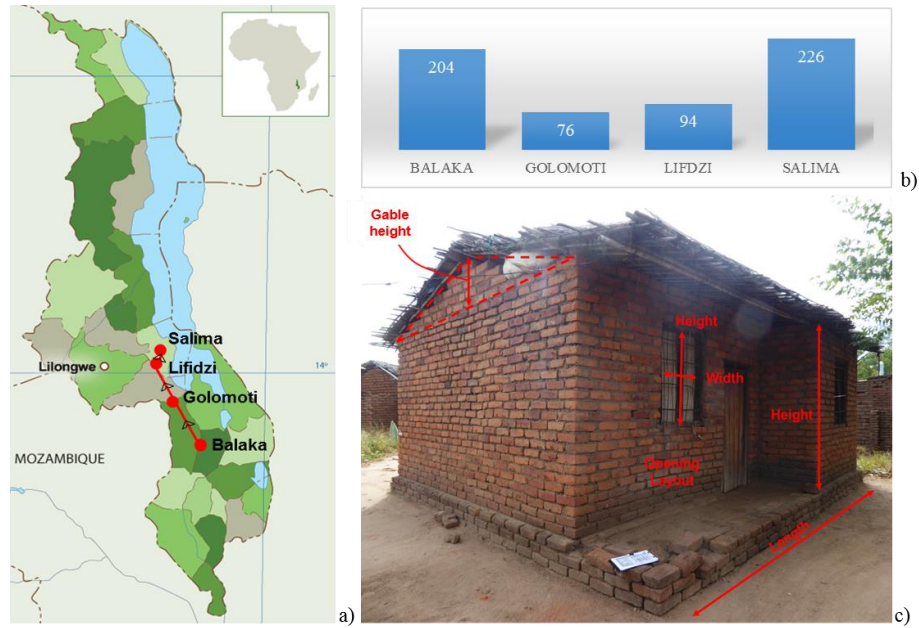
a) Building survey locations, Balaka, Golomoti, Lifidzi, and Salima; b) number of façades collected for each site c) geometrical measurements collected for each inspected façade
